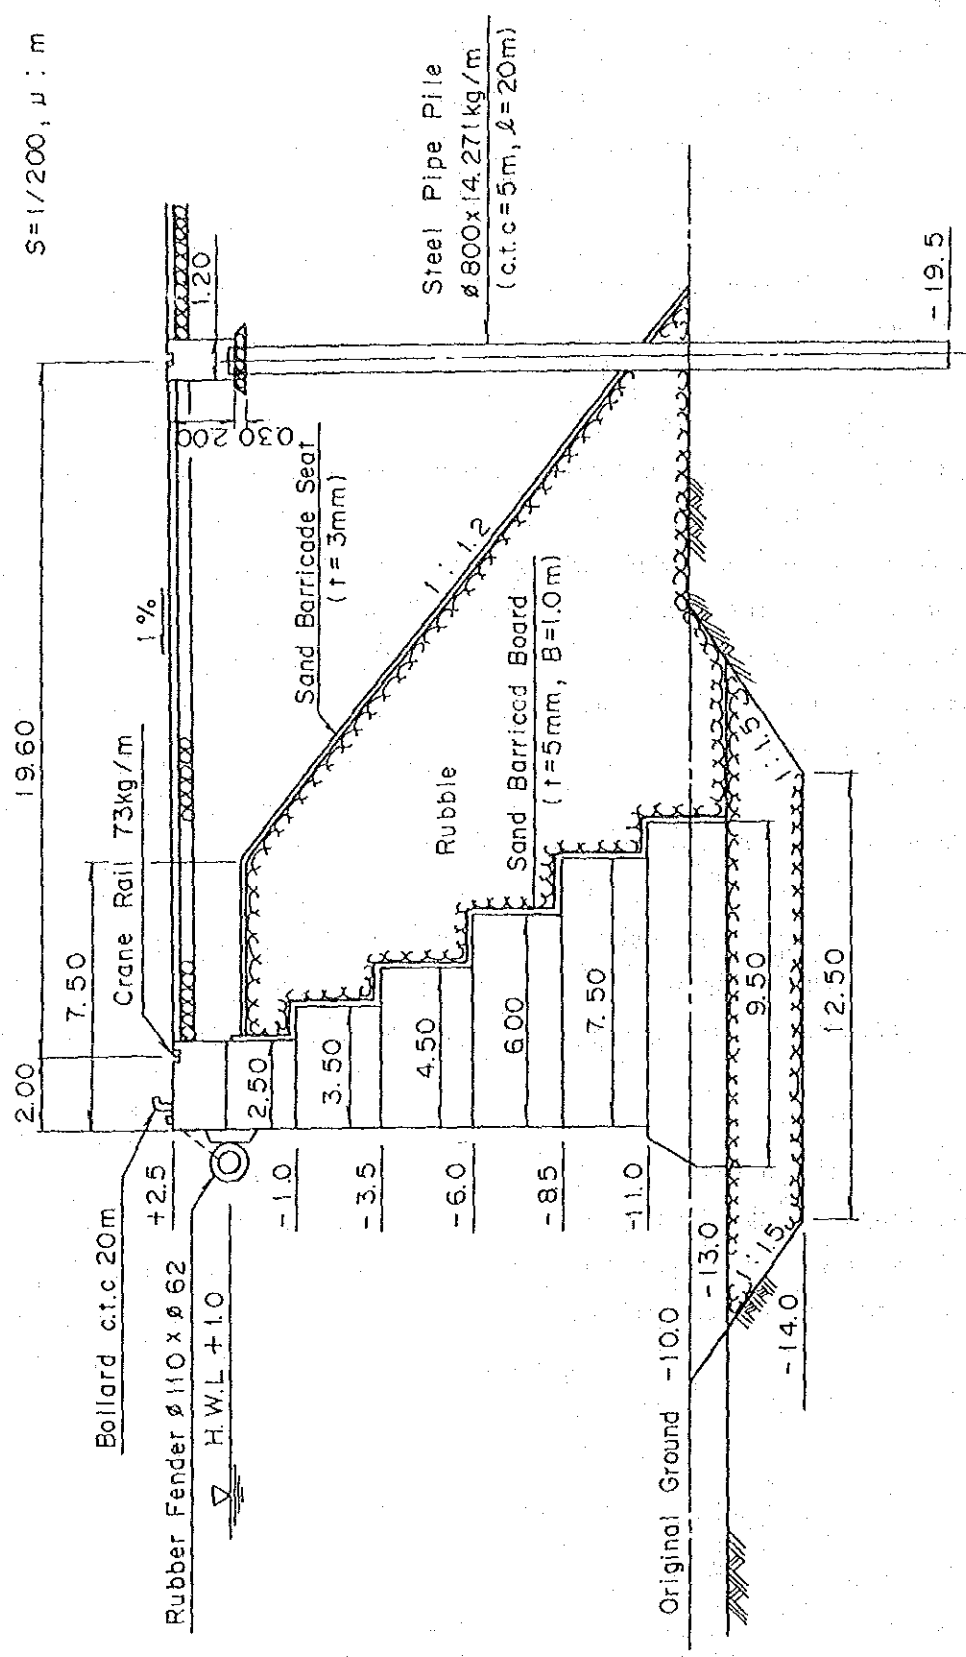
Typical Section of Concrete Block Type Quay
